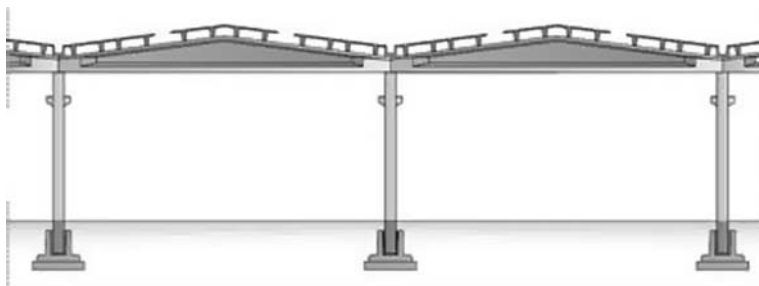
Subtype “1a”: one storey buildings with shed beams and ribbed roof elements
